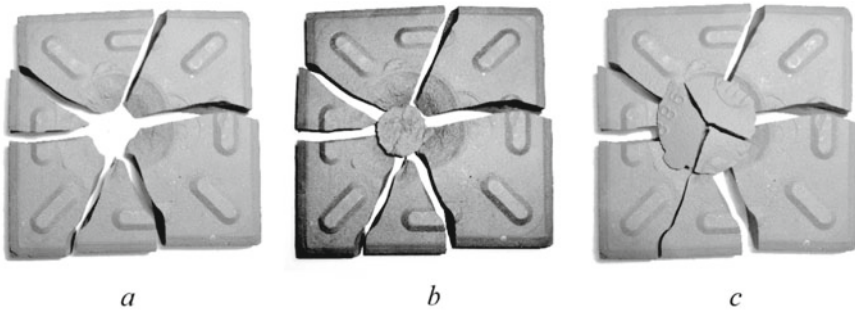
Multi-conical spalling destruction image at elevated power: without cone a, one- b, and two-cone c patterns
